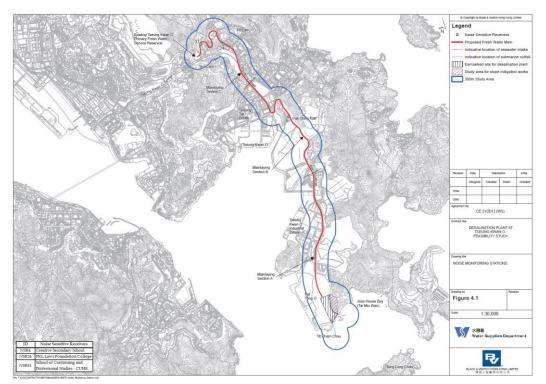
Site Layout Plan with Noise Sensitive Receivers and Desalination Plant
